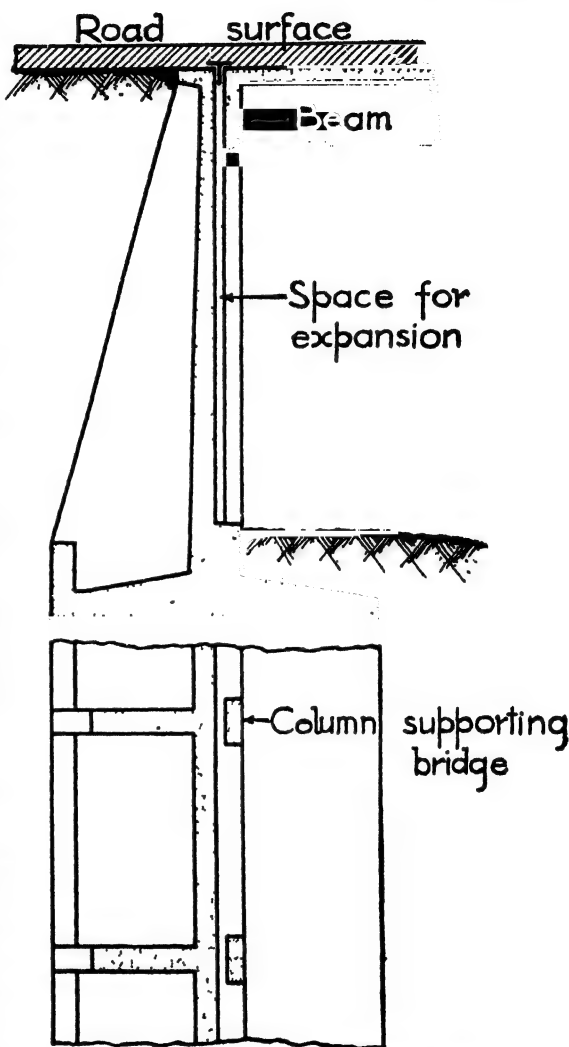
Flexible Column supporting End of Girder Bridge.
